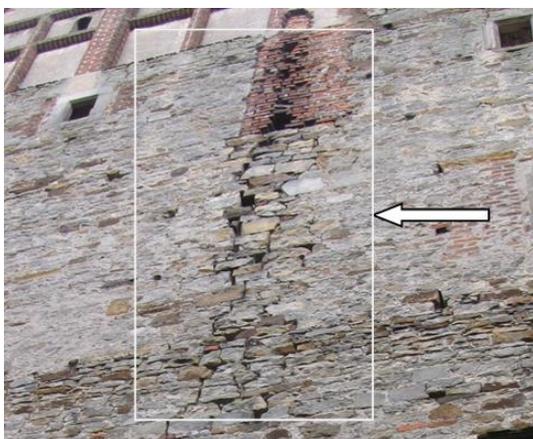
Damage to the masonry structure /castlein Drzewica/
